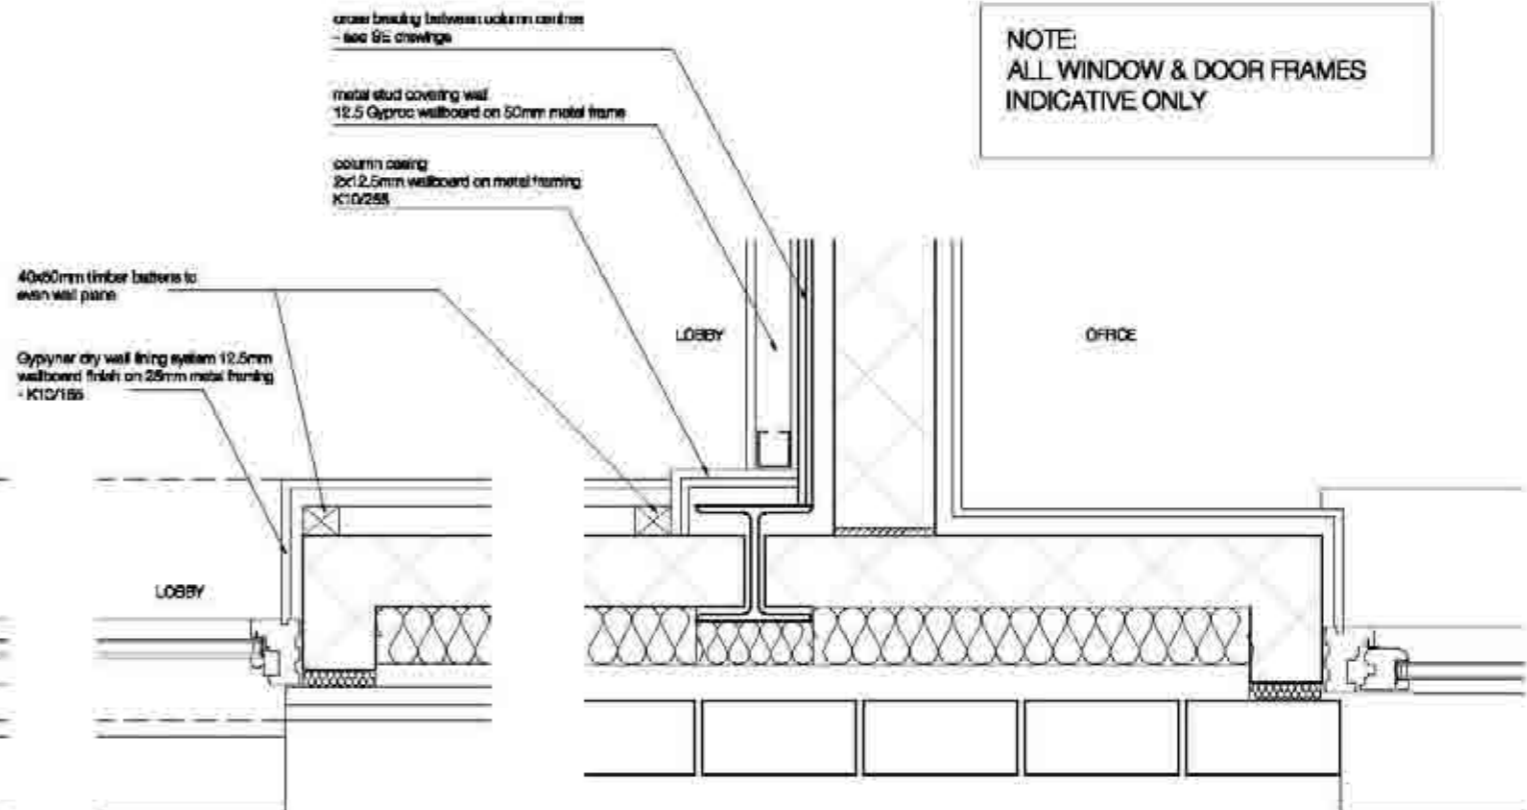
DETAIL OF ENTRANCE DOOR/ FIXED LIGHT JUNCTION
